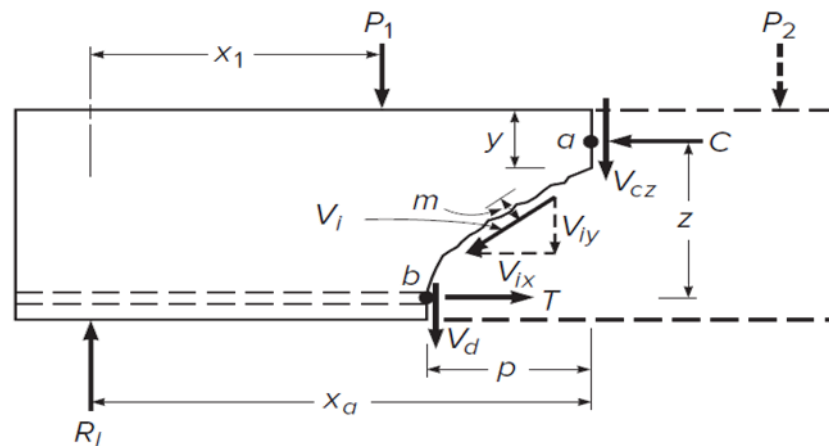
Forces Acting at a Diagonal Crack in a Beam without Web Reinforcement (Birkeland, 1966) [4].
